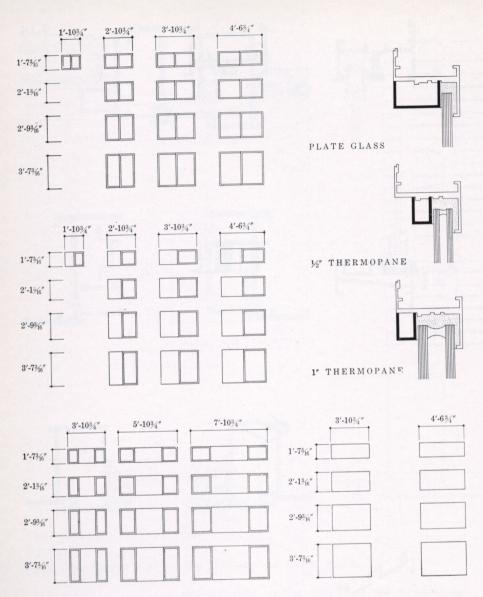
Horizontal sliding windows for residential type buildings, showing standard sizes and details. Concluded from Page 233.
